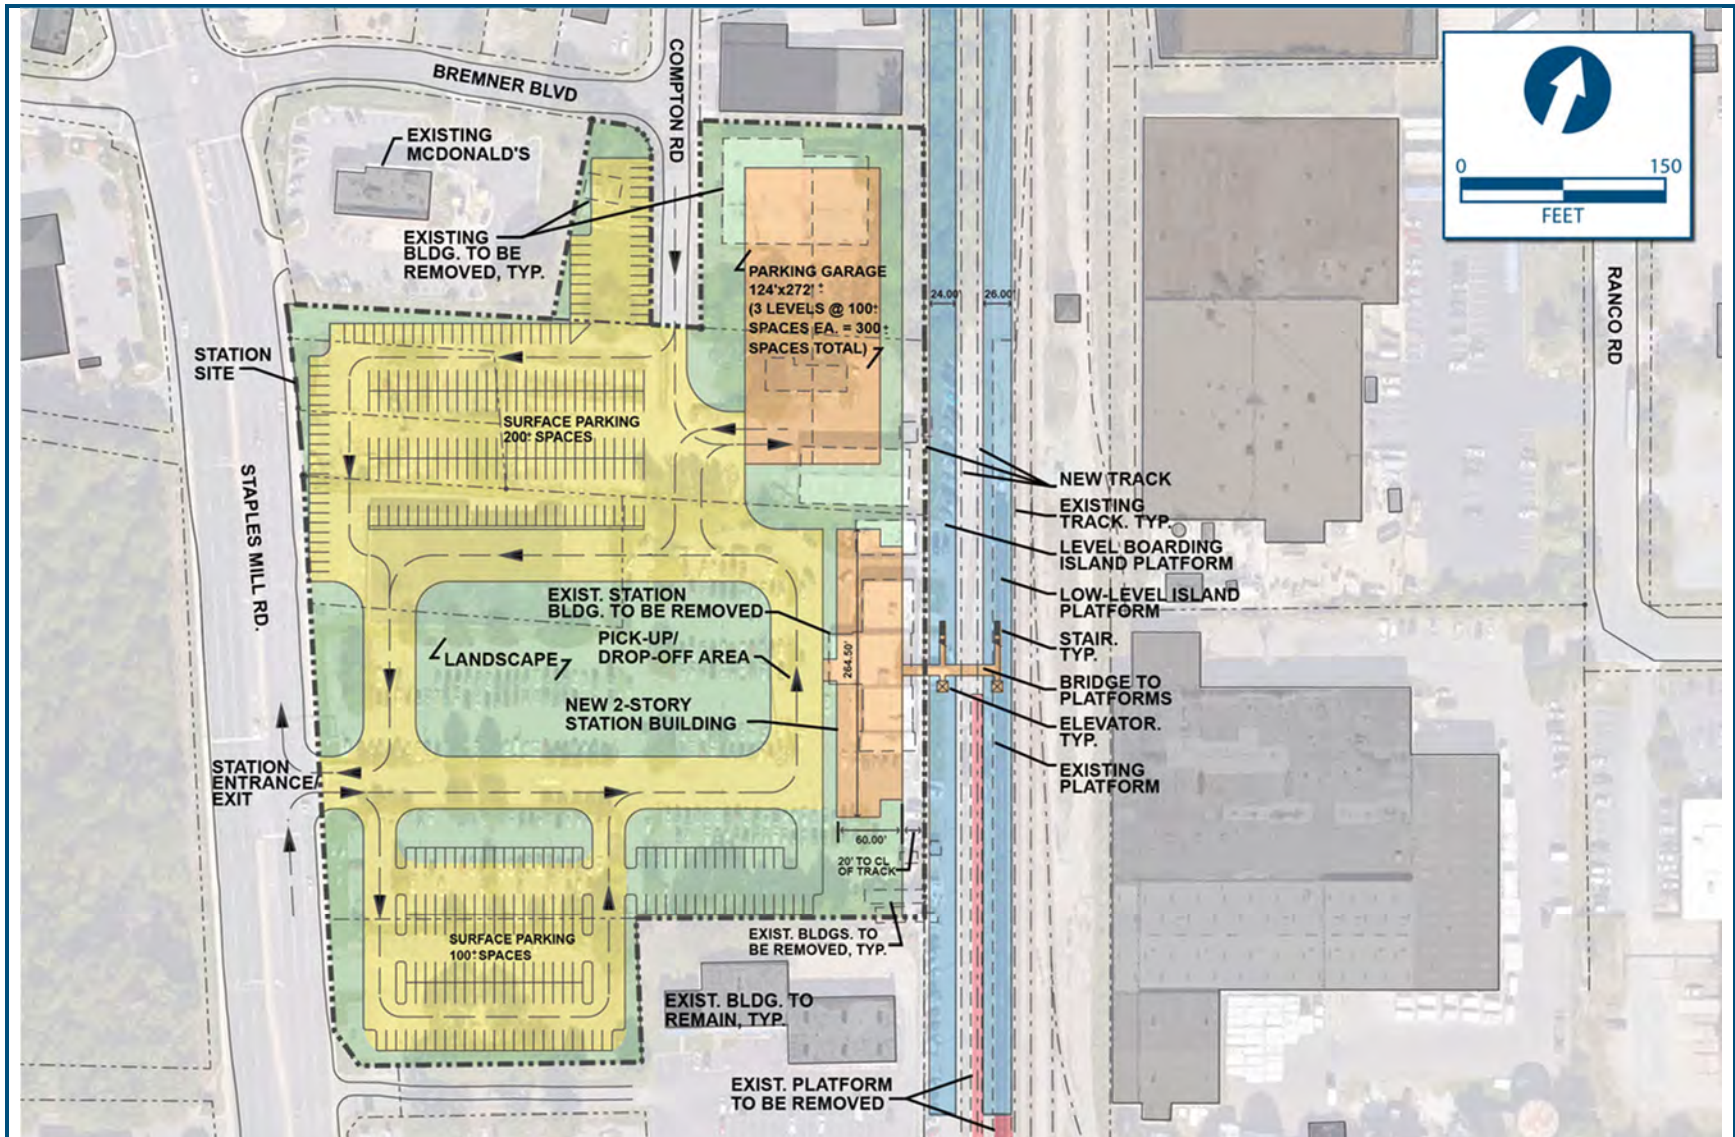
Staples Mill Road Station Improvements for Build Alternative 6E
